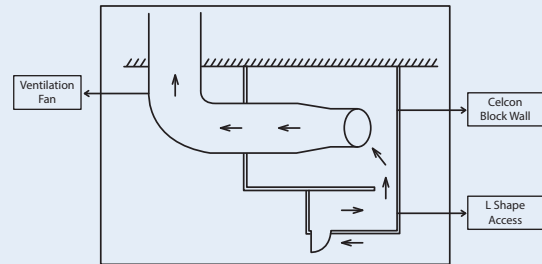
Plan view of Noise Enclosure for Ventilation Fan
